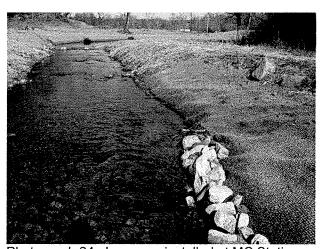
Looking downstream at rock J vane installed at MC Station 10+14. (1/16/04)
